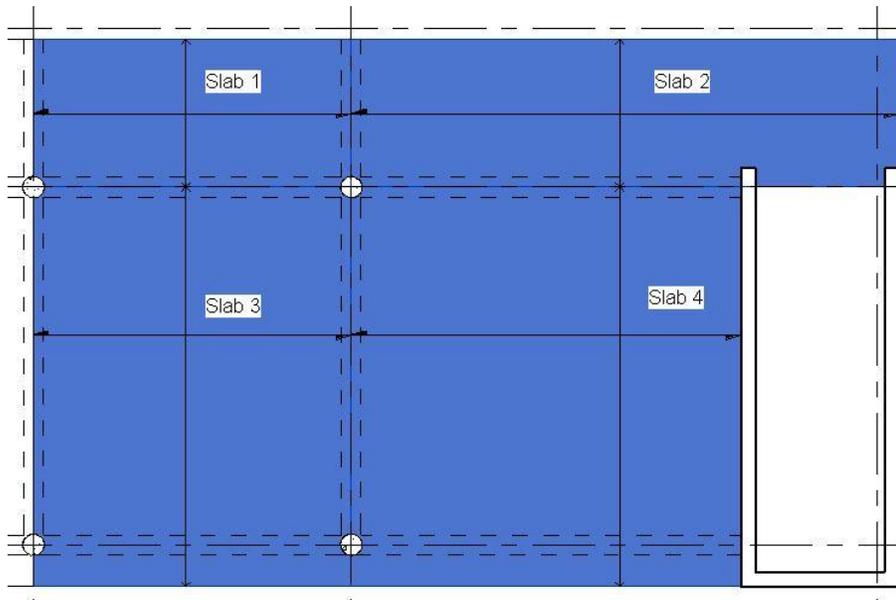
Floor Slab Panel by Panel (Image courtesy of CCIT)
